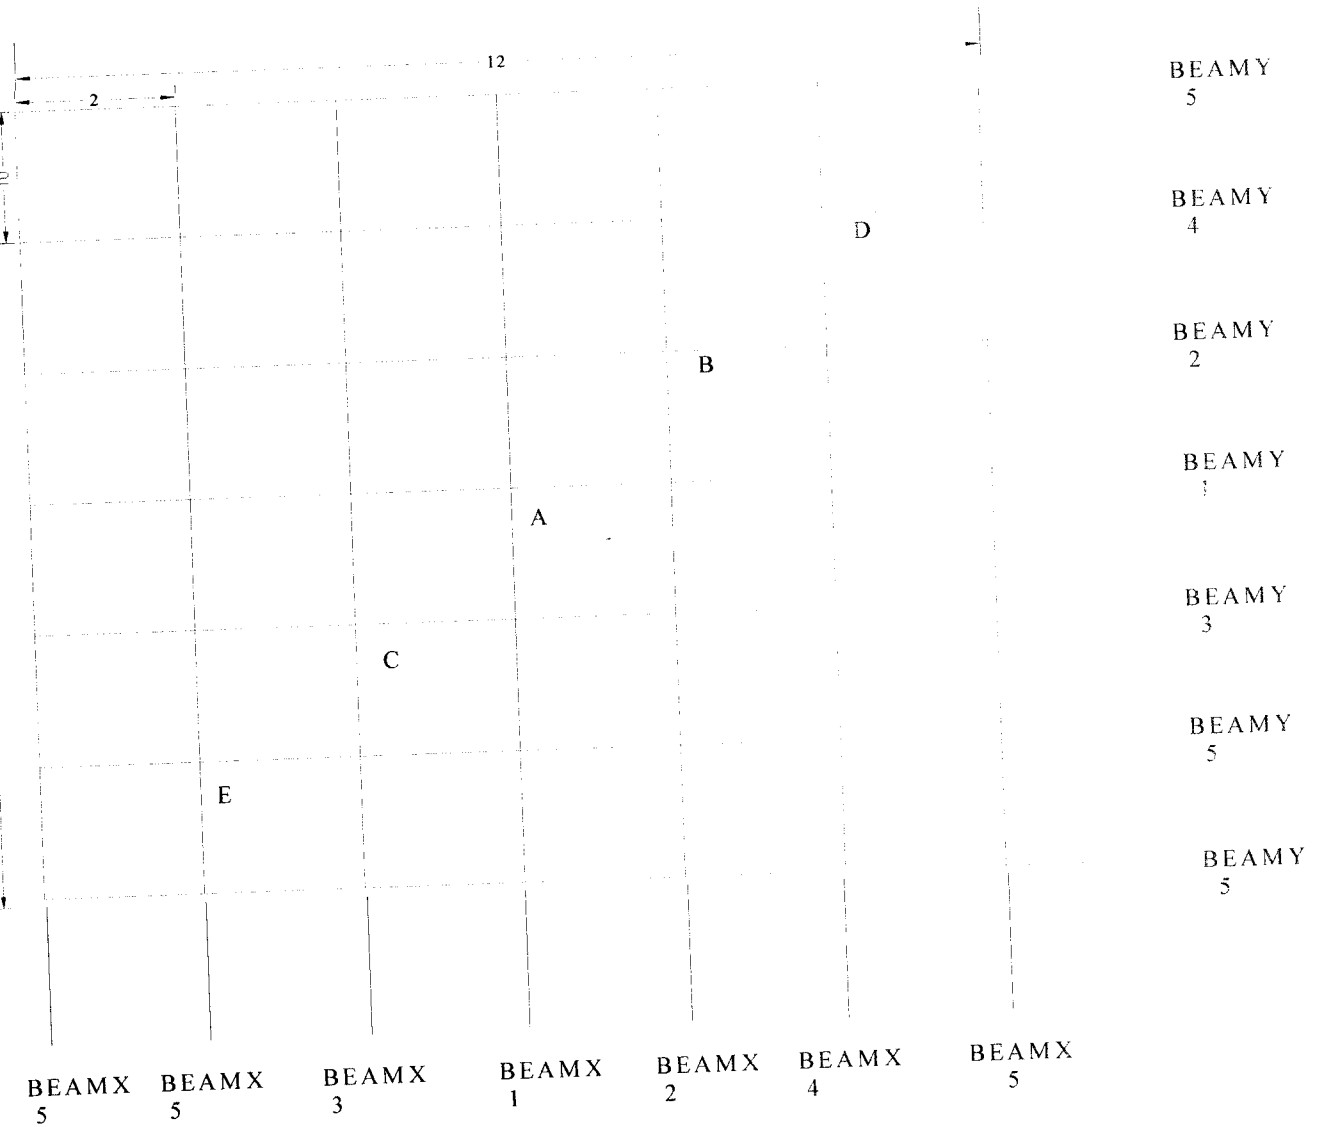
BEAMS FOR GRID FLOOR OF SPAN 12m
